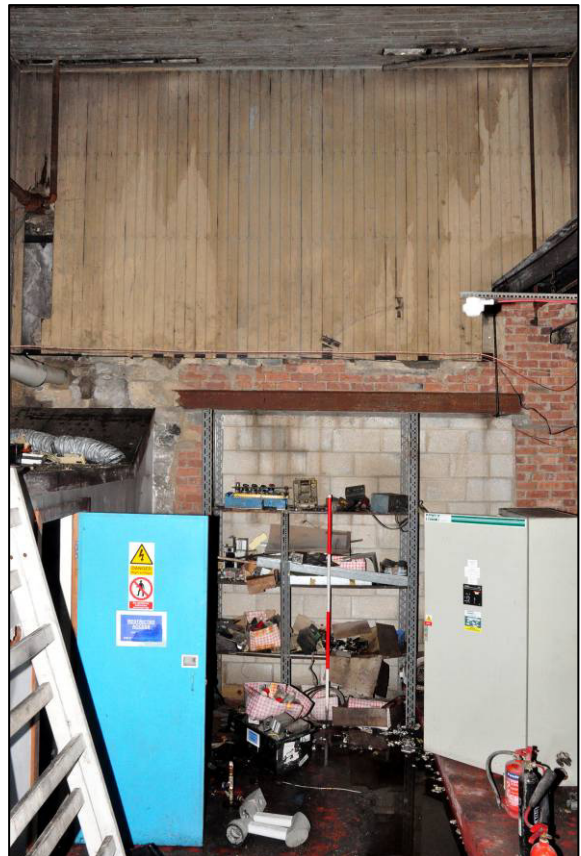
Southern engine house, ground floor, north wall, looking N (photo 11845).
